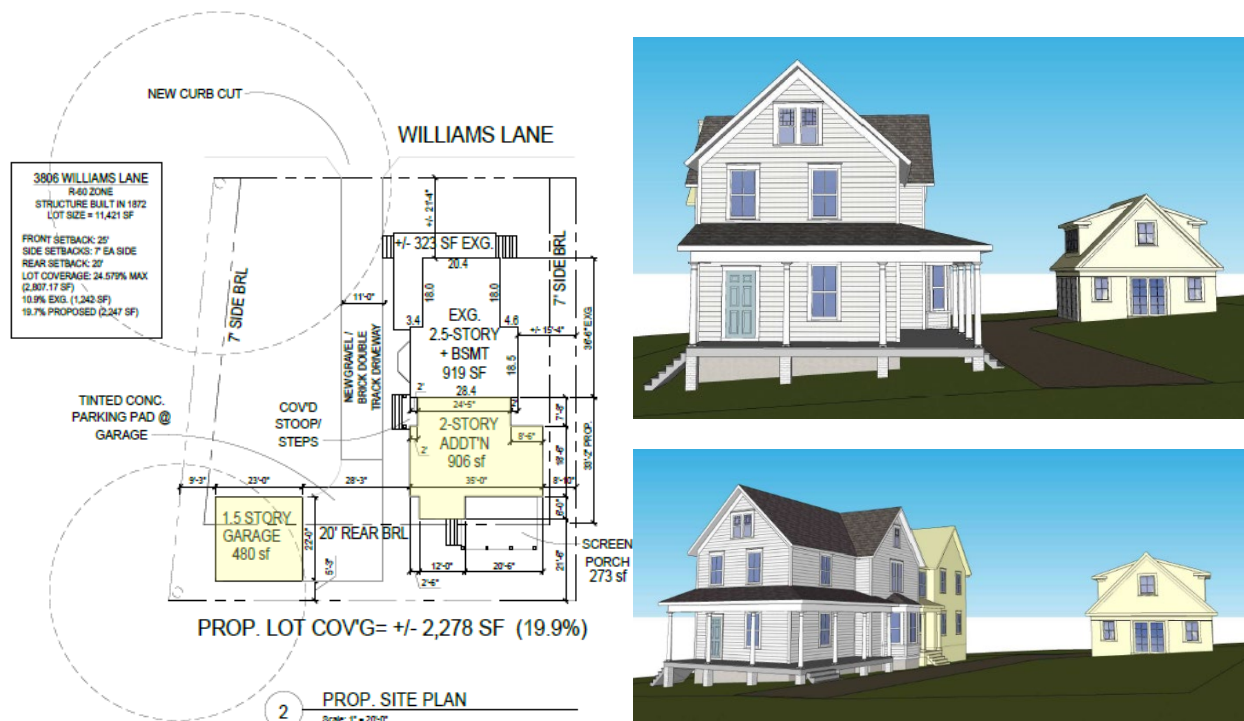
Site plan and renderings showing the proposed rear addition and accessory structure (shaded in light yellow).
